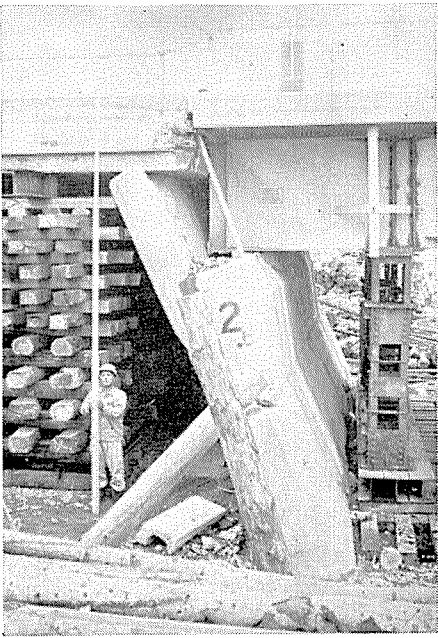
Pier tilted over and spalling of concrete is visible
